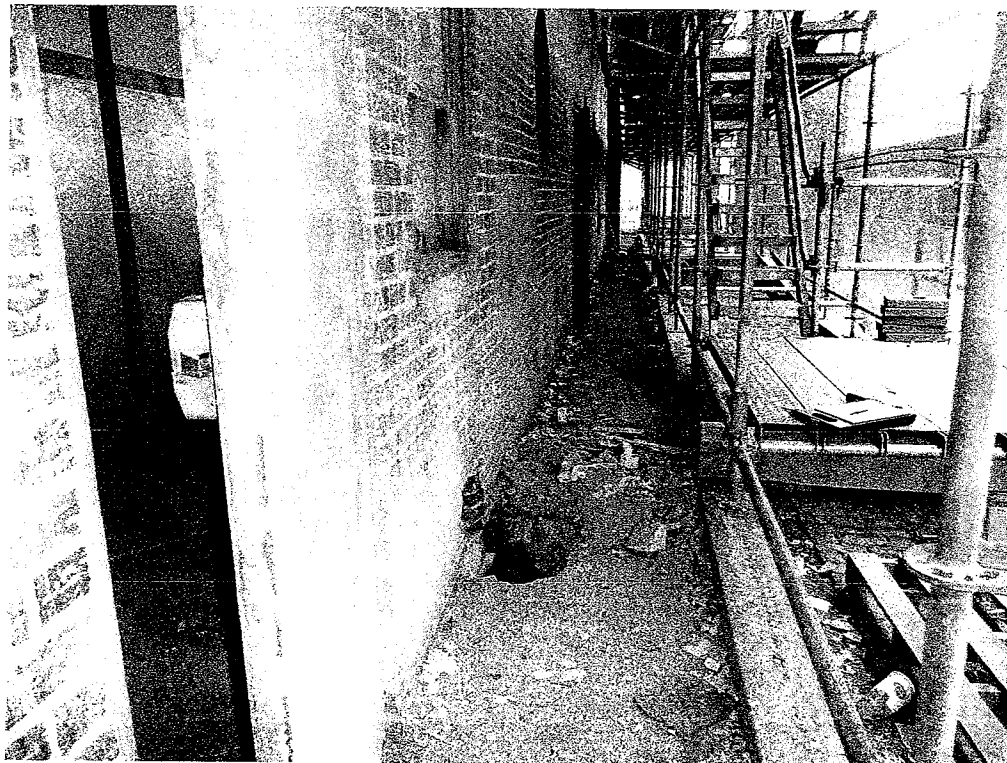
Opening at bottom of brick wall permitted access to measure existing foundation profile.
